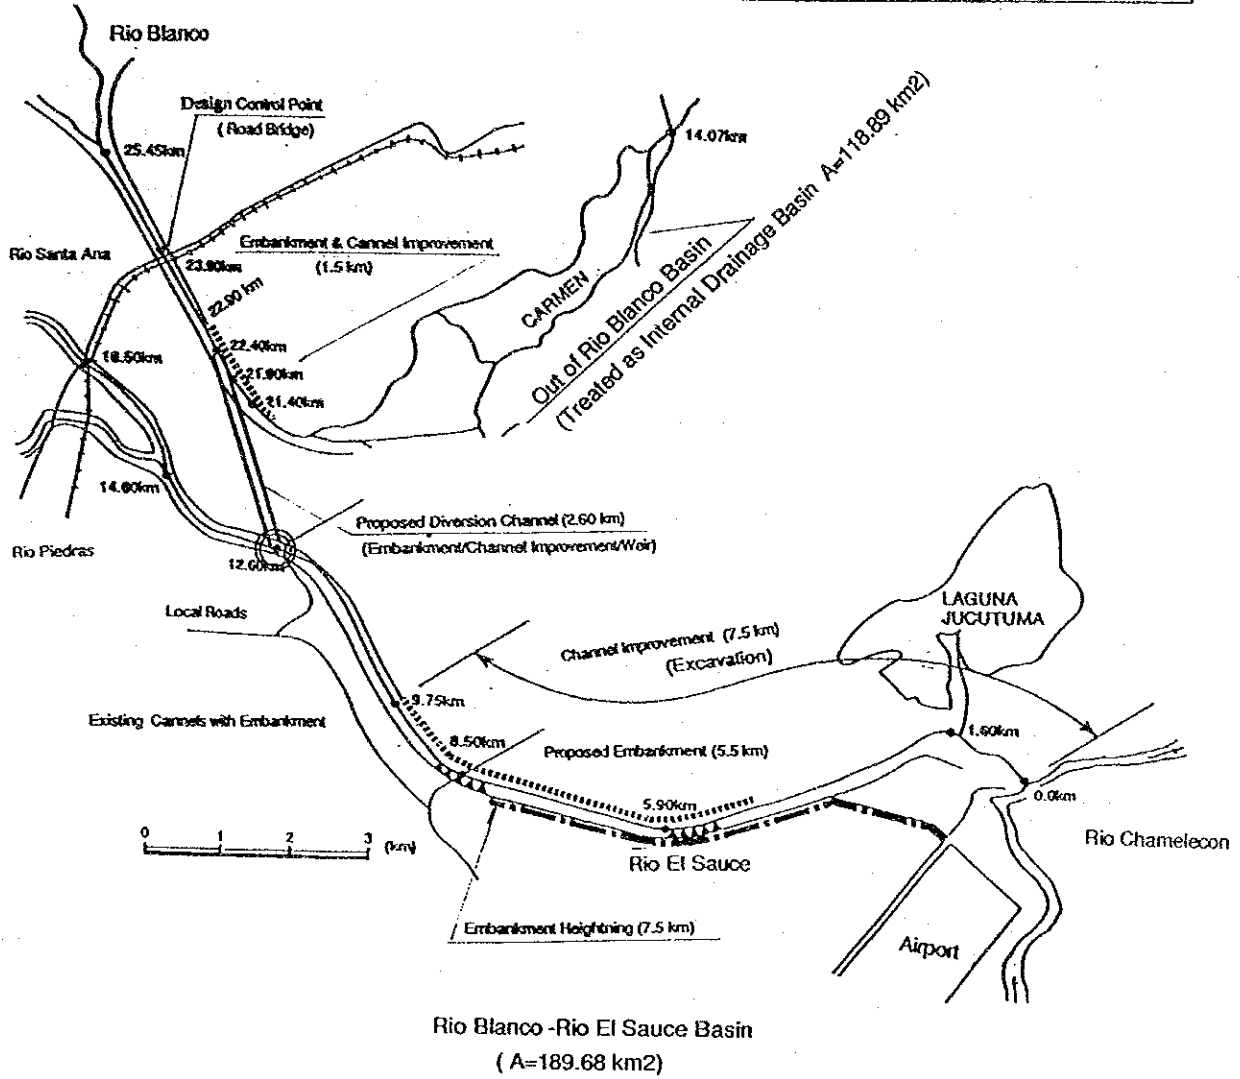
PROPOSED FLOOD MITIGATION FACILITIES OF THE RIO BLANCO AND EL SAUCE (ALTERNATIVE 2)
